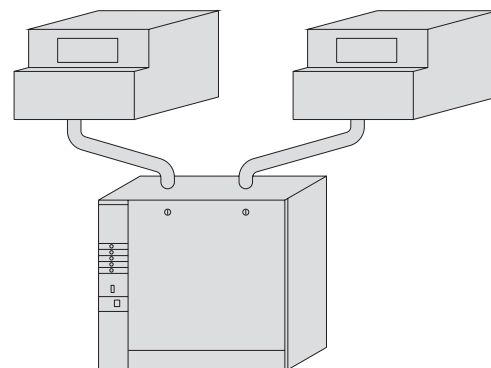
EHF-2 fan package mounted on EHU-701.
